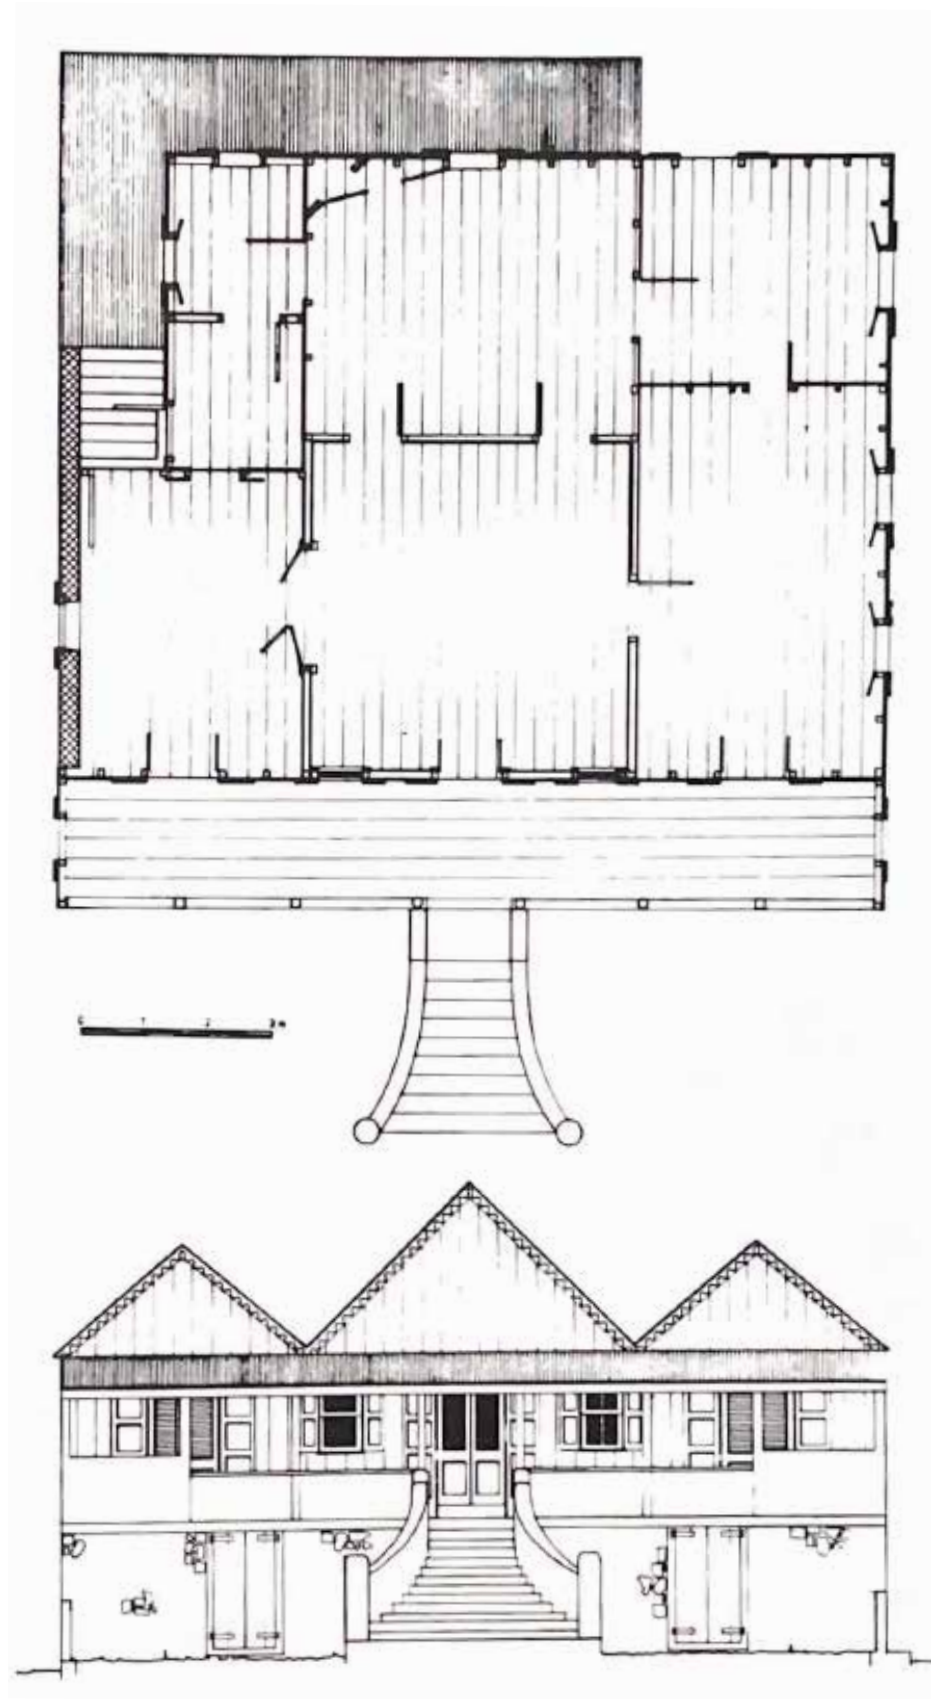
First-floor plan and front elevation of the Belvedere plantation house, representative of traditional Sint Maarten architecture. Drawing by S. Dijkshoorn, 1990
